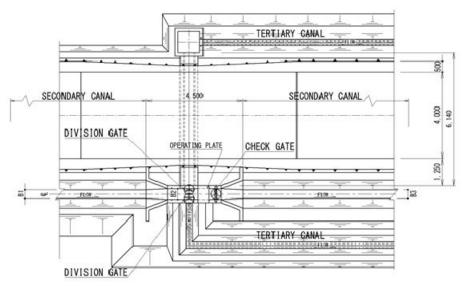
Division Works on Secondary Canal
